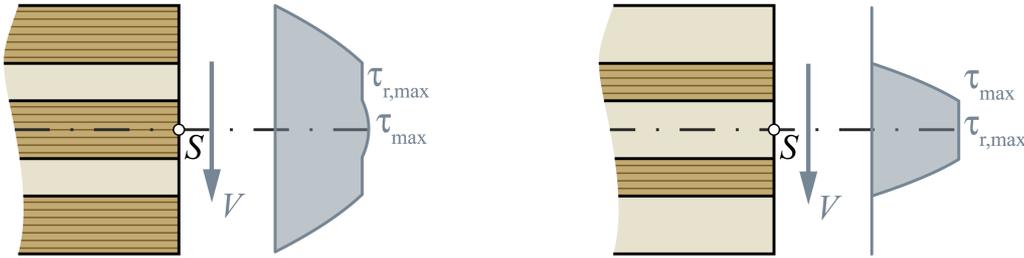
Shear stress distribution over the cross section of a CLT element loaded out-of-plane assuming  $E_{90,lay} = 0$ : longitudinal layers as top layers (left); cross layers as top layers (right).
